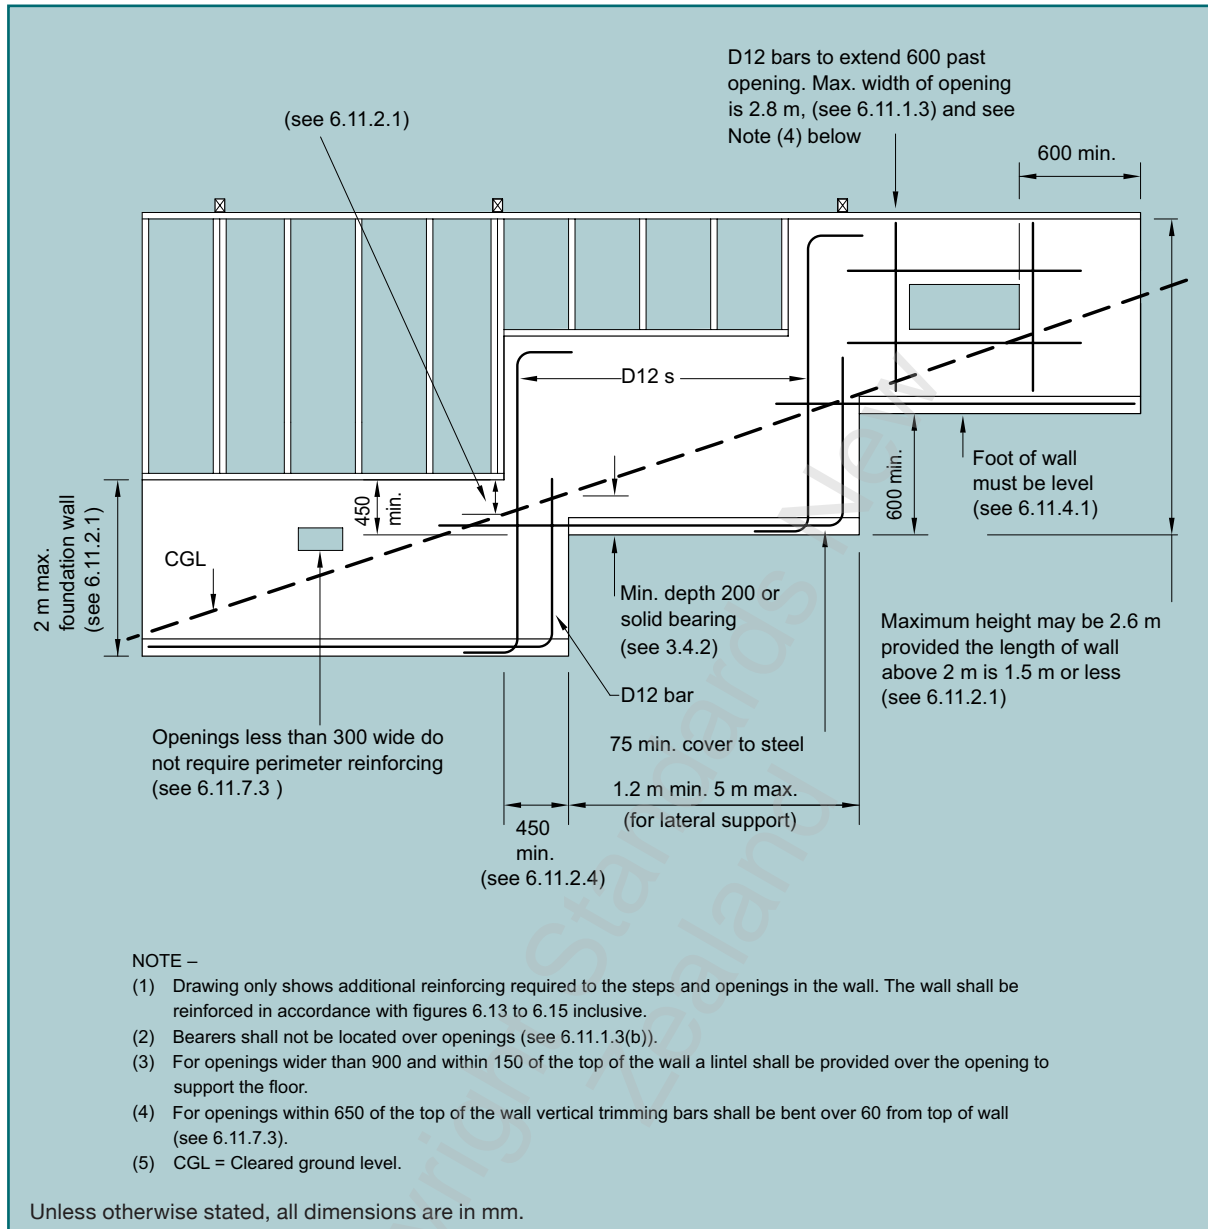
Foundation walls – Openings and steps (see 6.11.1 and 6.11.2)
